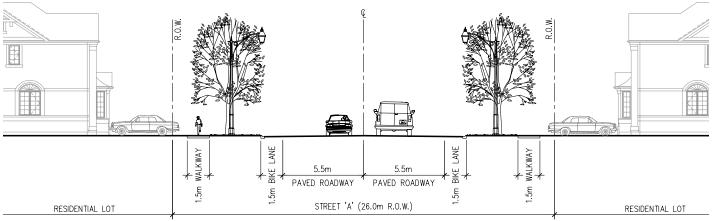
Street 'A Cross Section (26.0m R.O.W.)
